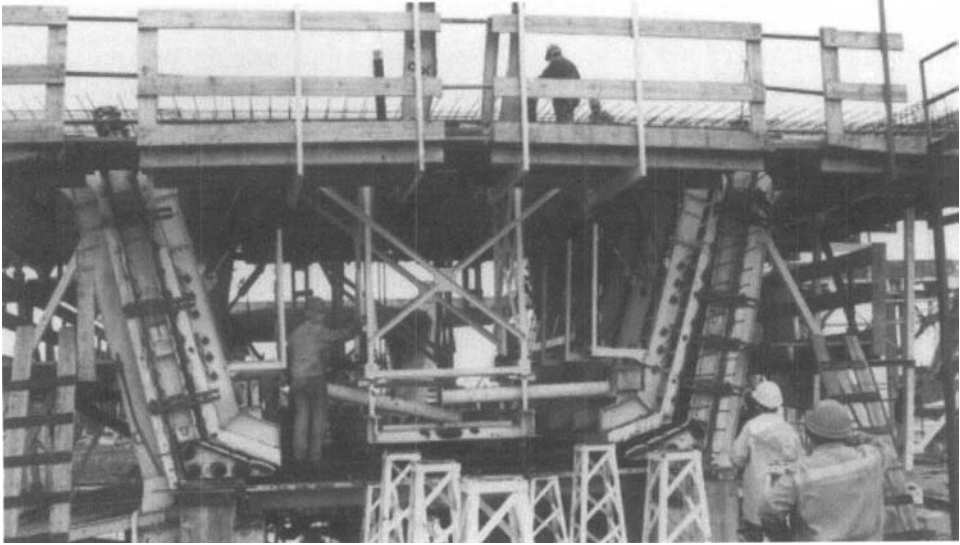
Initial inspection of formwork, central viaduct, Lisbon, Portugal
